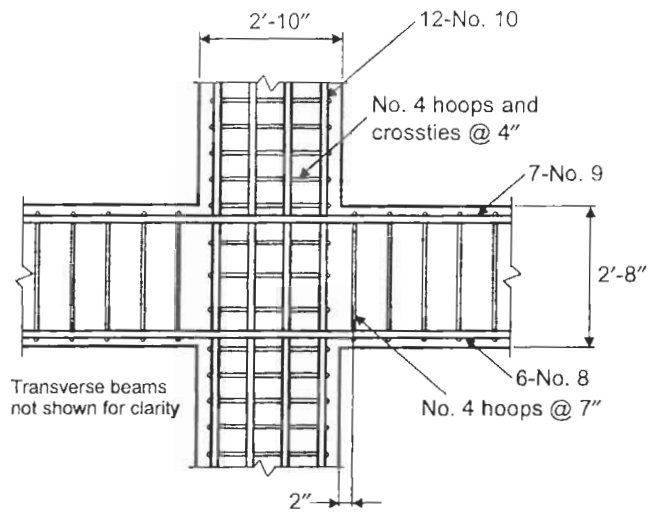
Reinforcement Details at Interior Beam-Column Joint (SDC E)
